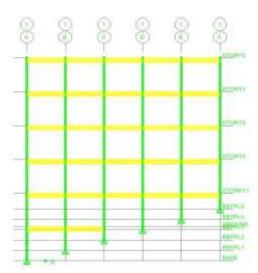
Elevation of step back building for five storey model (300 slope)
